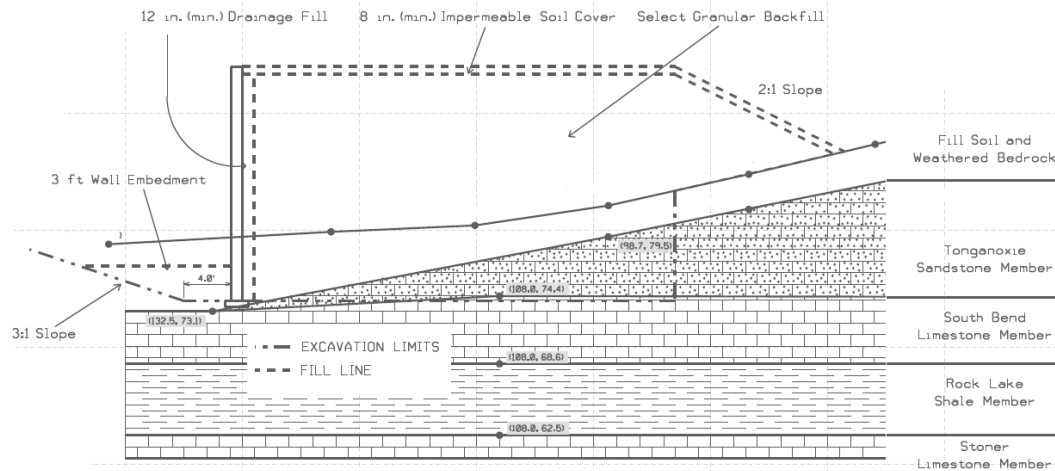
Proposed cross section of MSE wall and subsurface (Provided by KDOT).
